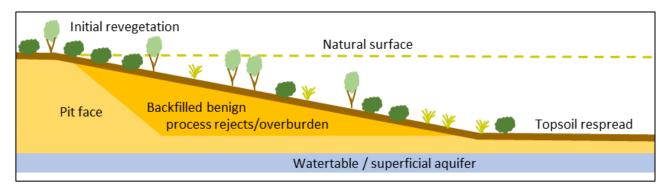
Conceptual Planned Backfill and Rehabilitated Pit Walls
